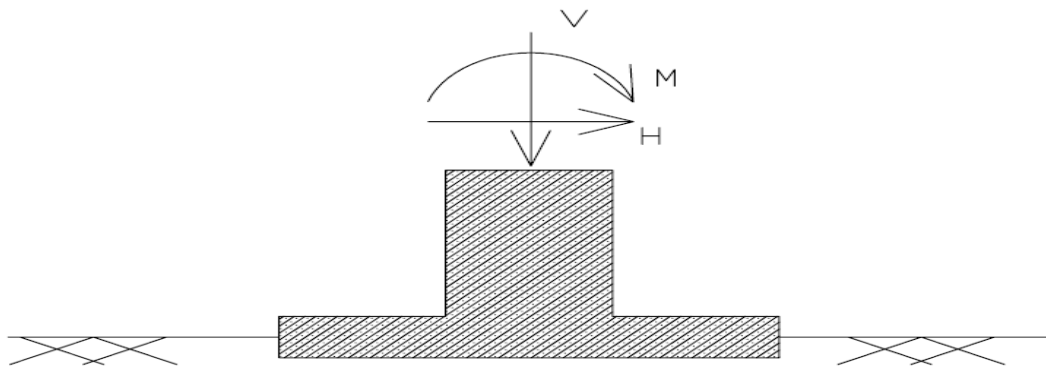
Schematic illustration of a shallow foundation under combined loading.
